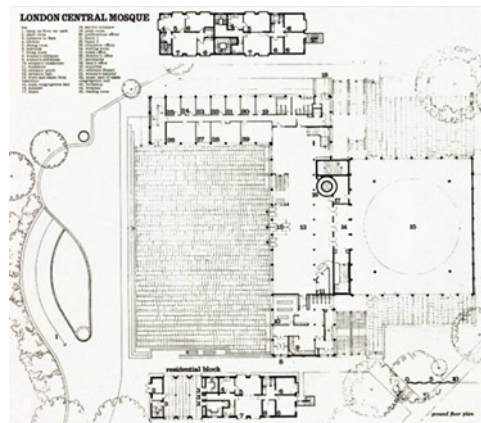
Ground floor plan of London Central Mosque. (Source: <https://www.architectural-review.com/buildings/gibberds-london-central-mosque>)
